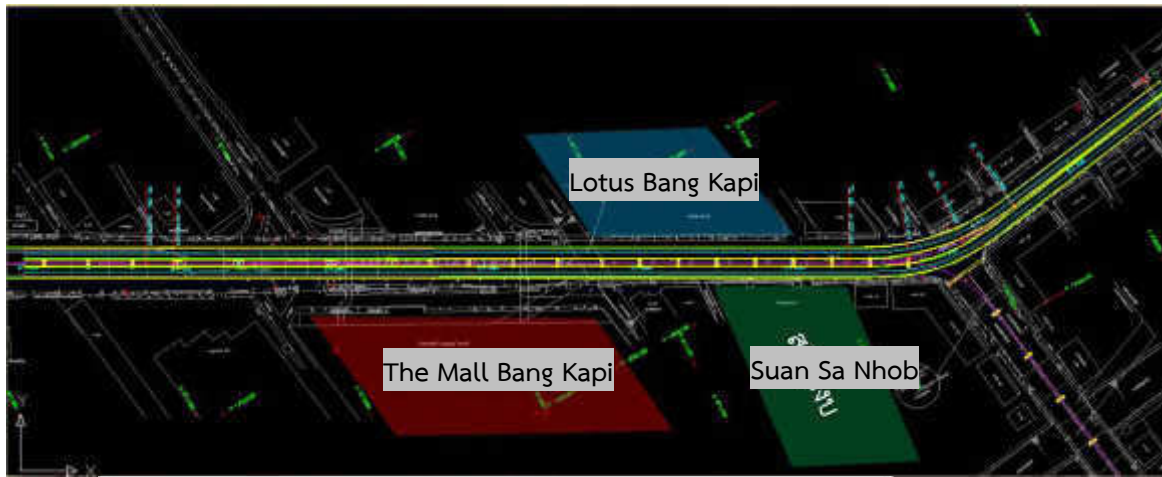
11 Plan and Cross Section of Guide Way at Bang Kapi Flyover Bridge
